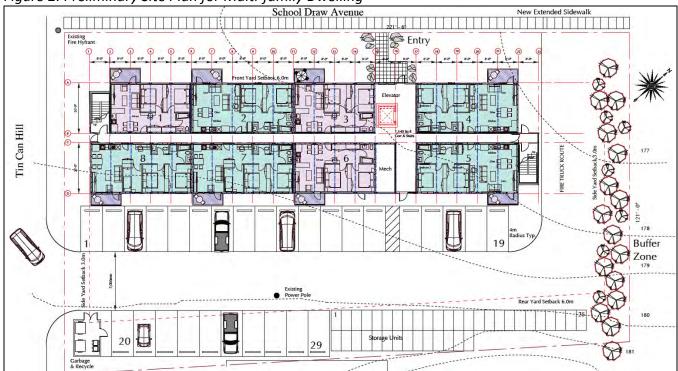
Preliminary Site Plan for Multi-family Dwelling
